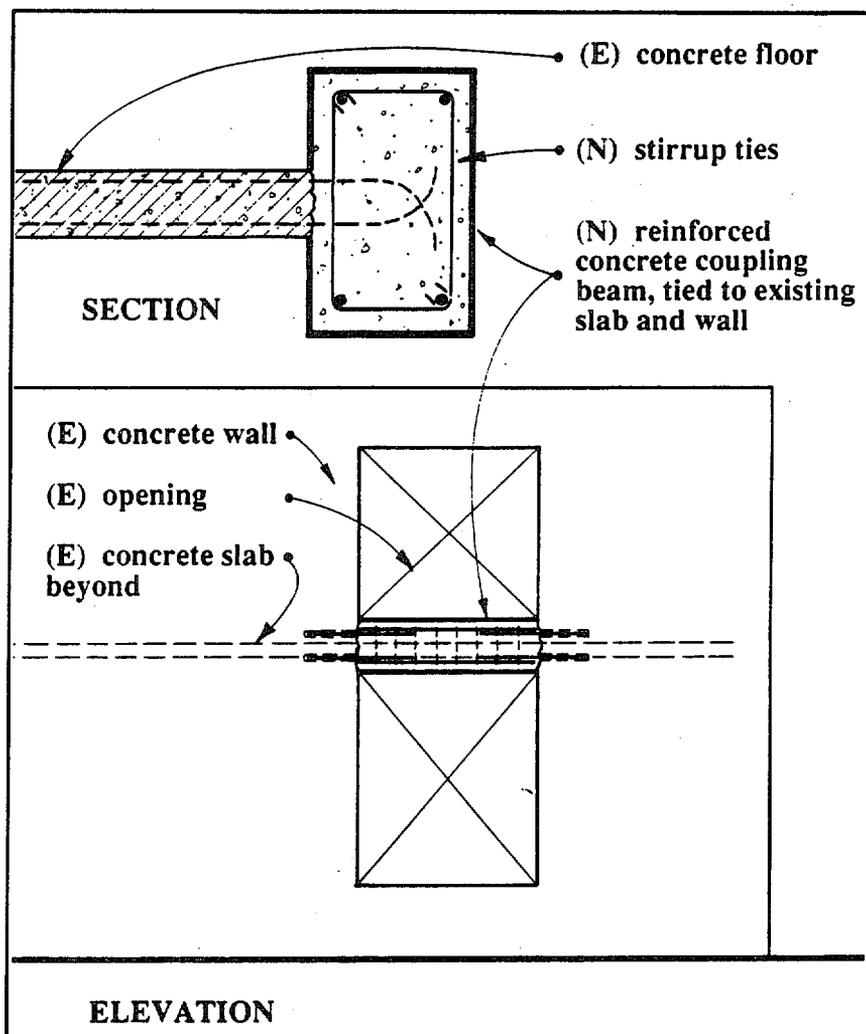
Example of strengthening an existing coupling beam at an exterior wall.
